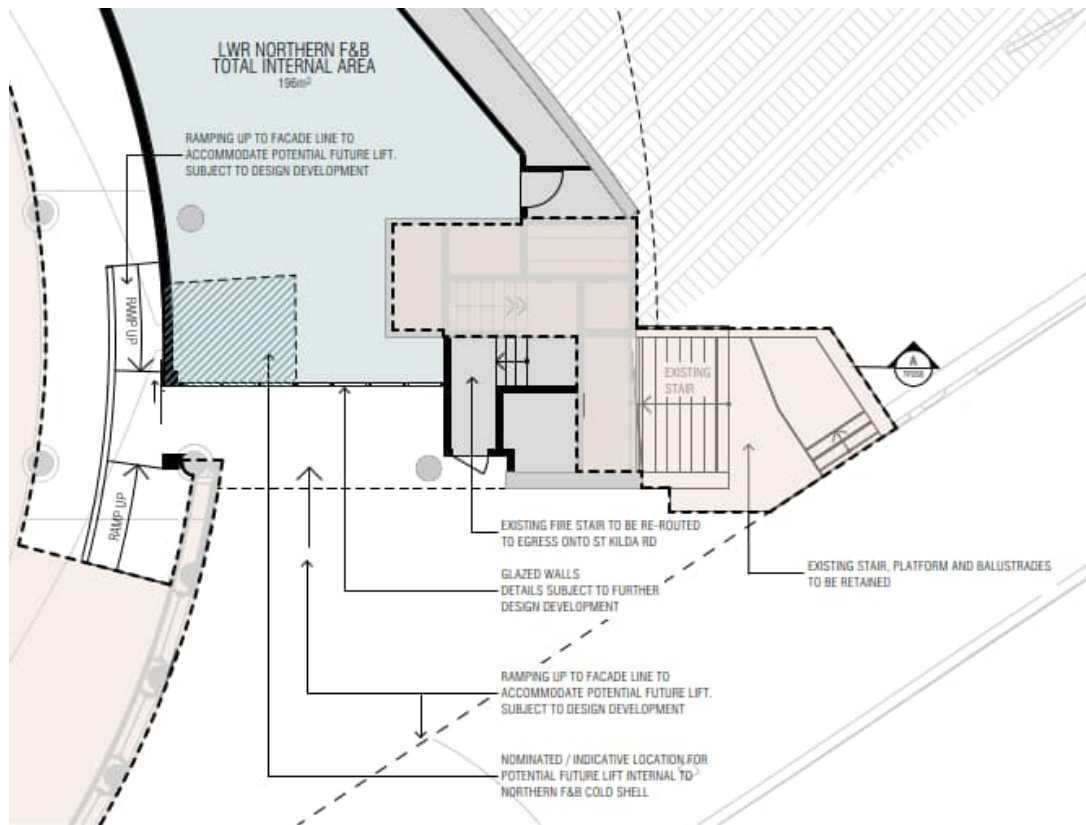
Potential further ramping to forecourt and foyers to accommodate potential future lift to the St Kilda Road elevation.
